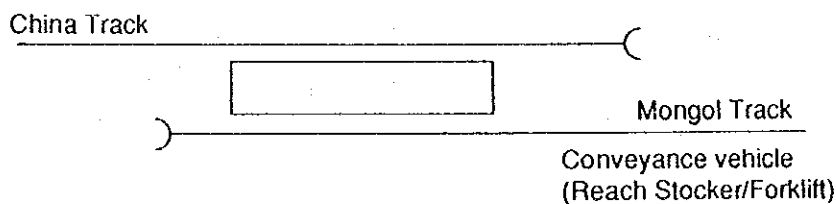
Track Layout by Different Transshipment Equipment
